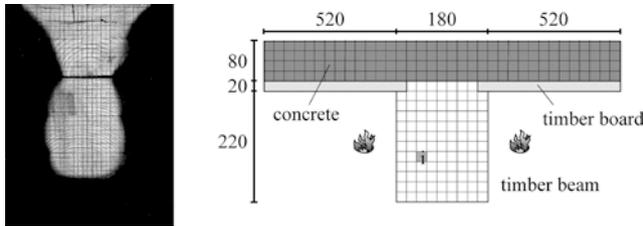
Cross-section of the timber beam failed after 63 minutes of ISO-fire exposure at *left* and modelling of cross-section *right
